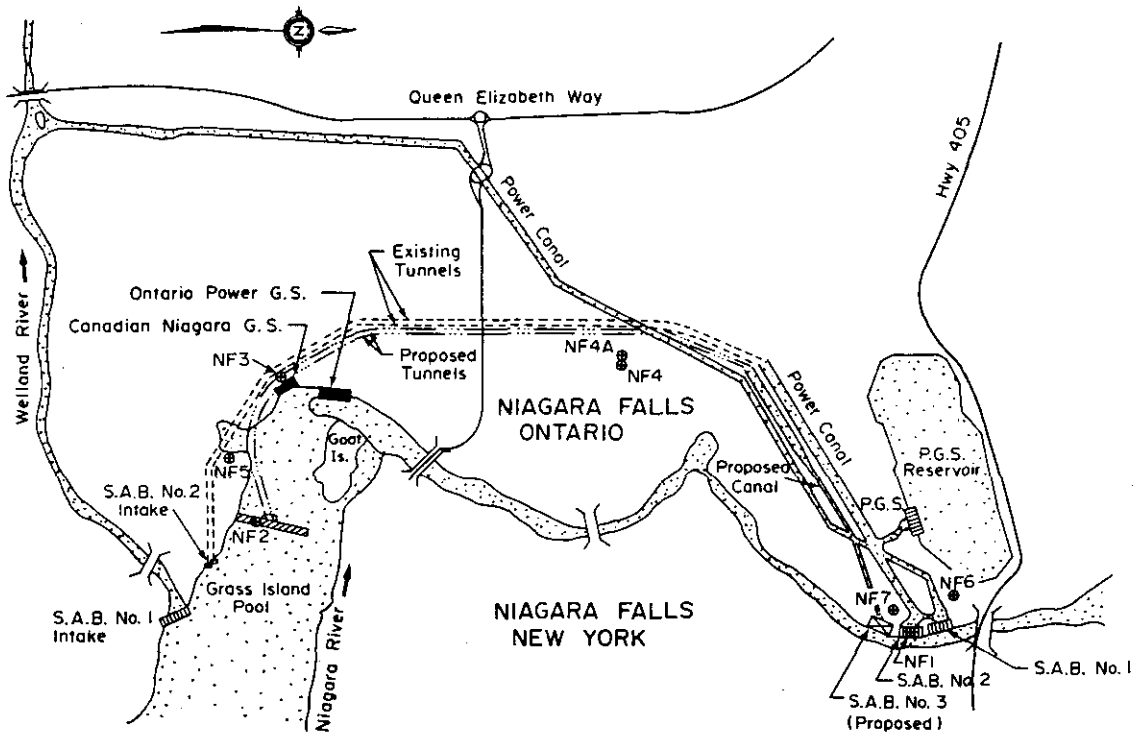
General plan of Sir Adam Beck Niagara Generating Station complex [8]
